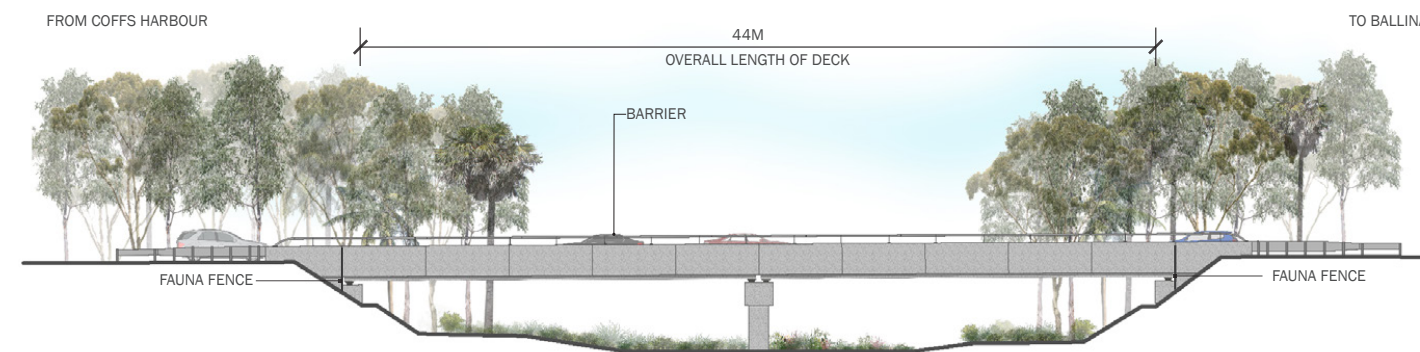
Floodway bridge (Wardell Bridge) - elevation (Scale 1:400)
